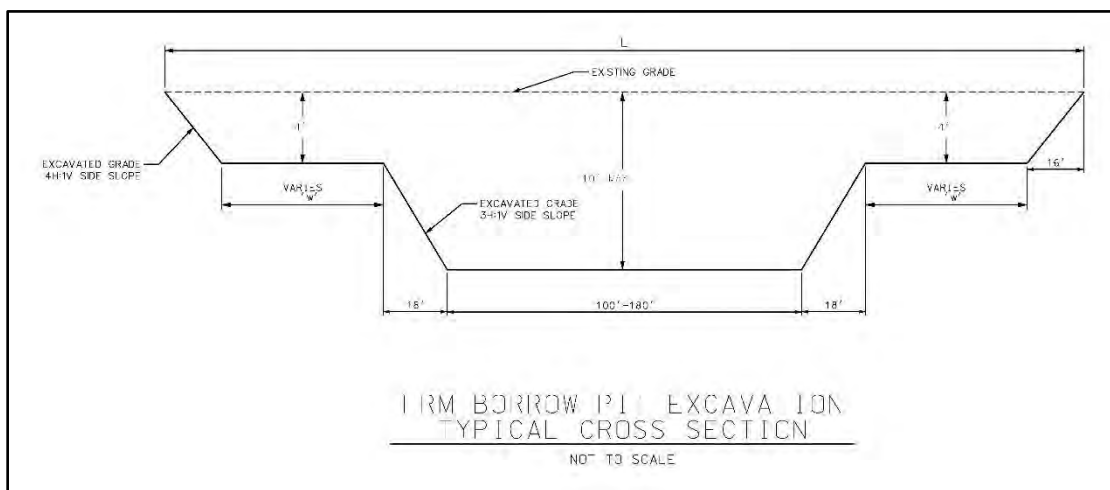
Typical Cross Section of the Proposed Borrow Pit
